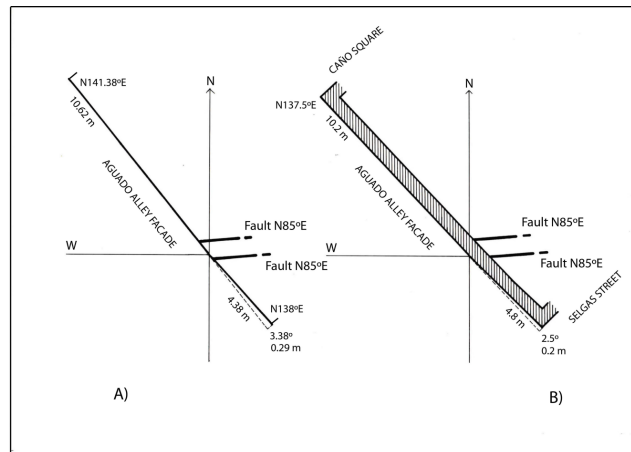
The Aguado alley facade of the 6 Selgas Street house, shown in plan view with its southern part bent to the northeast. (A) Present-day horizontal section at ground level, after reconstruction of the house; and (B) Horizontal section at ground level presented by the archaeologists in 2021, prior to reconstruction of the house. In both pictures, the vertical projection of the edge of the bent facade lies between the two faults revealed in the excavation.
